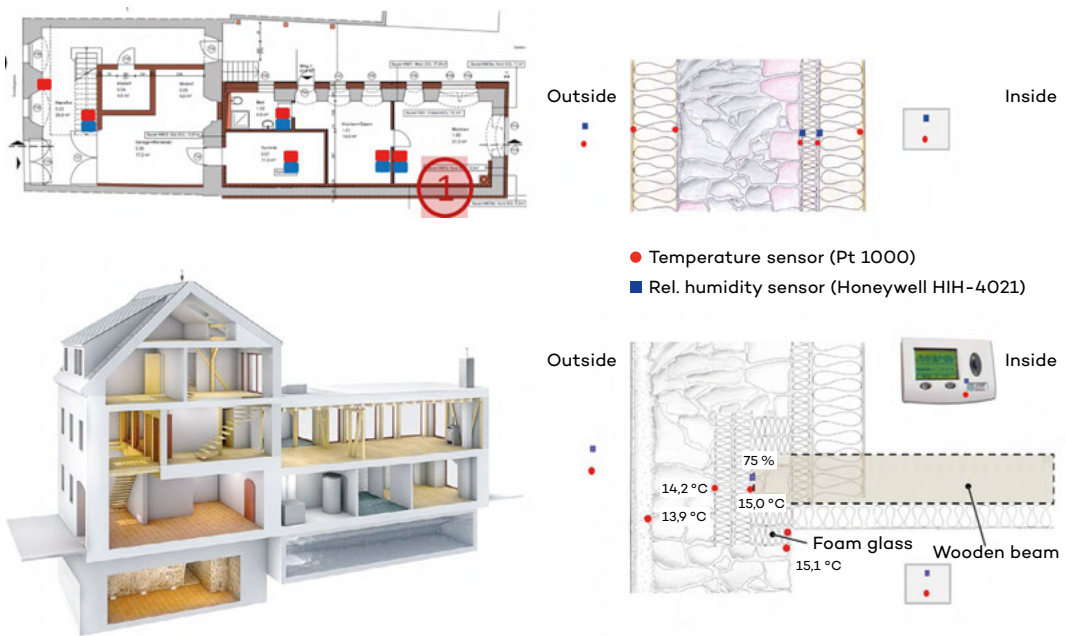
Monitoring system: measurement sections on plan and in section, arrangement of sensors in the wall construction and at the wooden beam end
